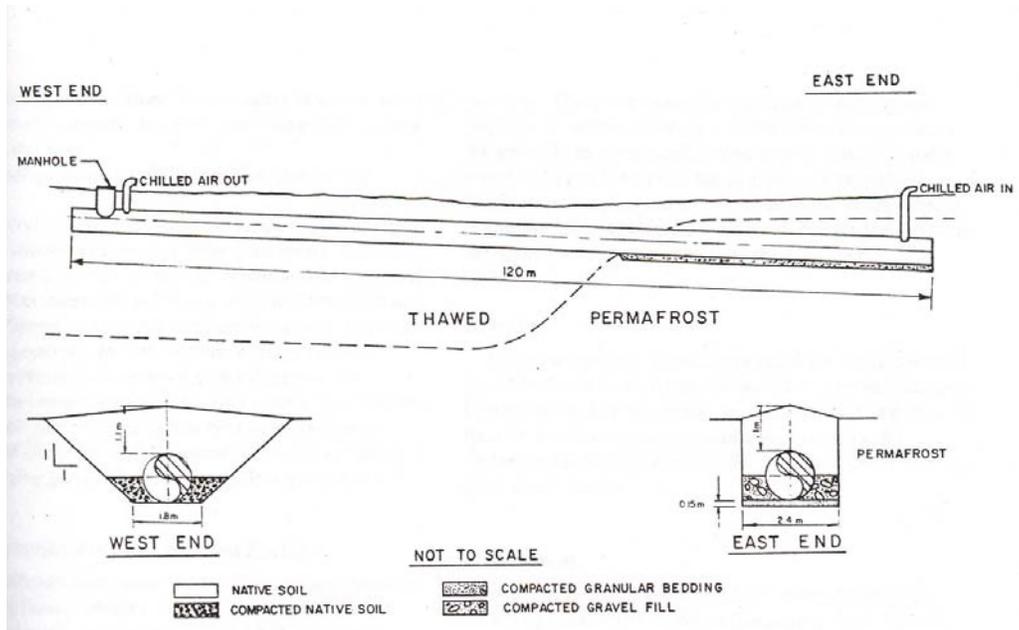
Interface test pipe. Fairbanks frost heave test facility
